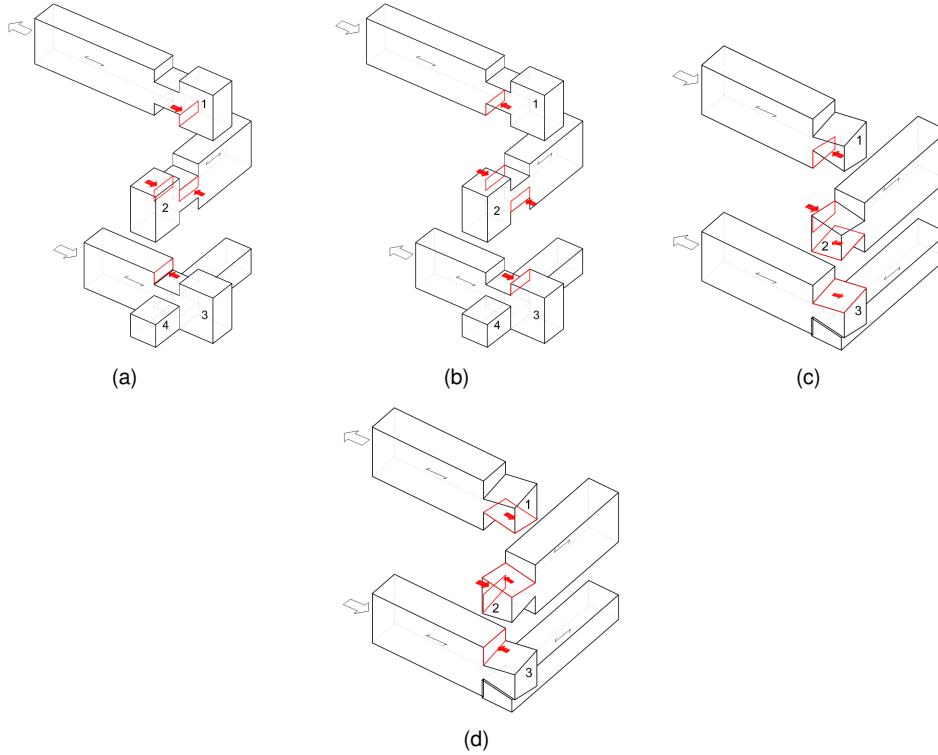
Load bearing mechanisms for Standard corner specimen - a) pull out test - b) push out test - c) for Tirolershloss corner specimen pull out test - d) for Tirolershloss corner specimen push out test.
